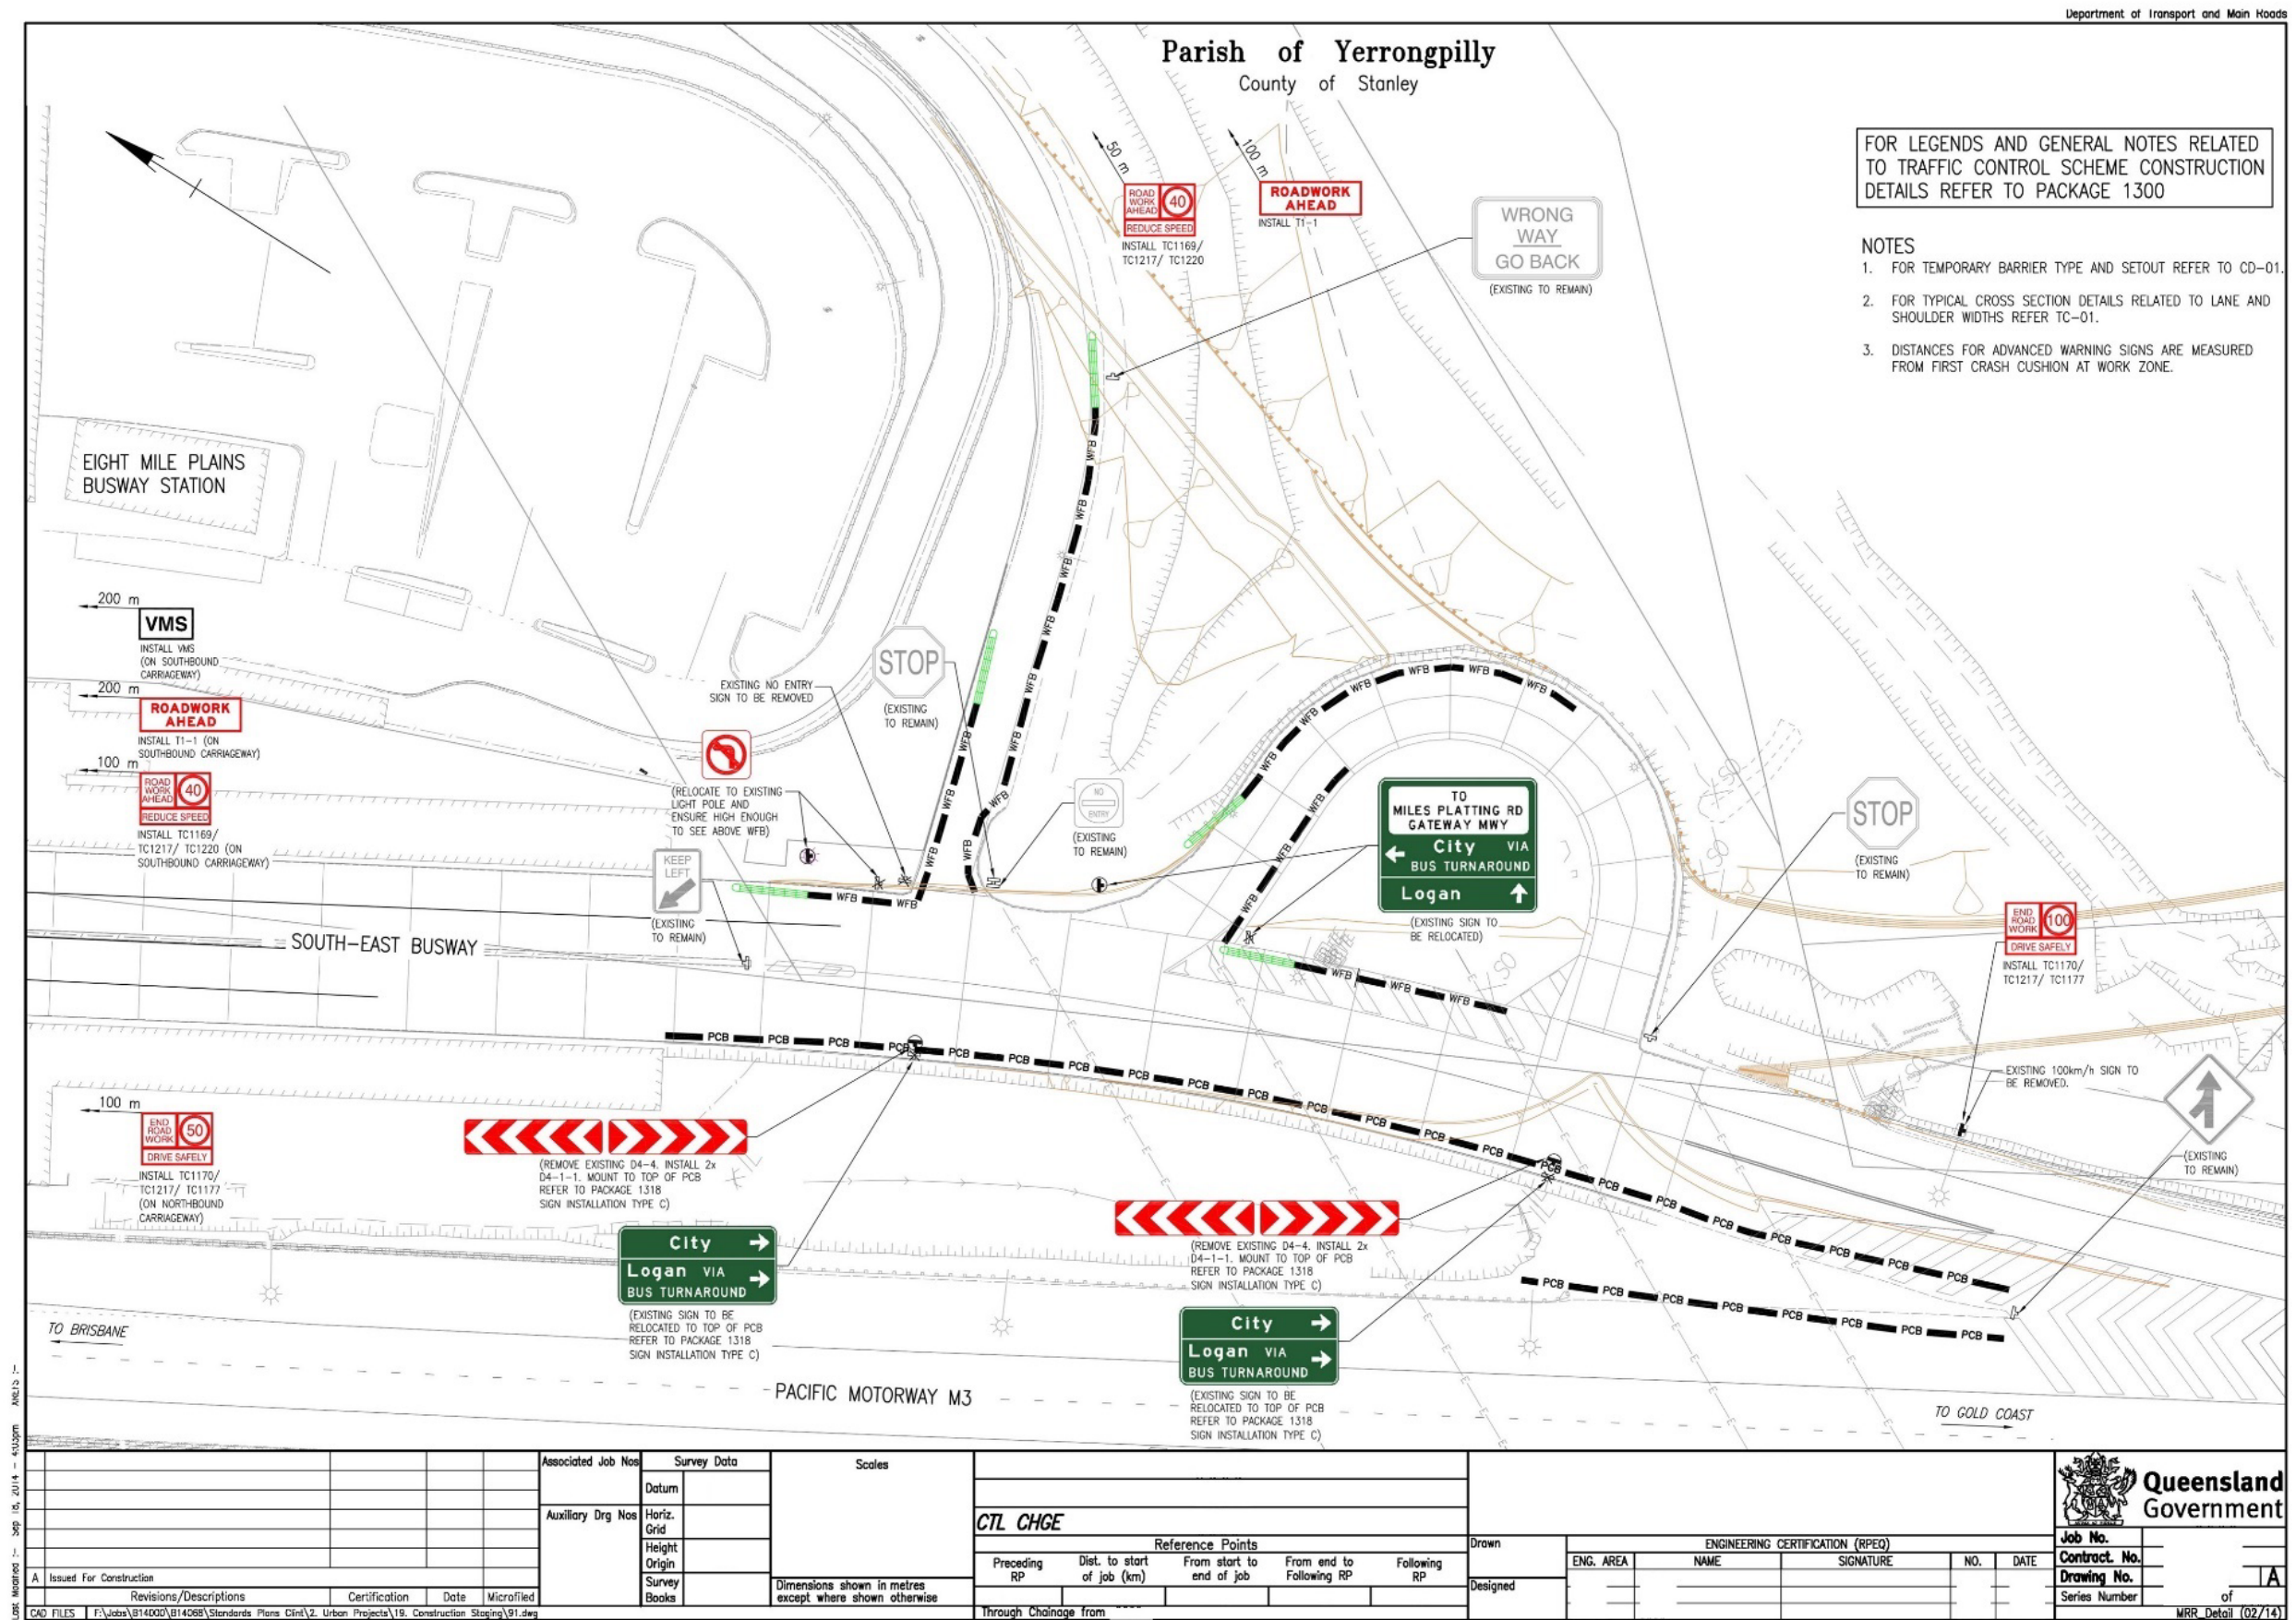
(c) – Construction staging – generic example 2 – sheet 1 of 2
